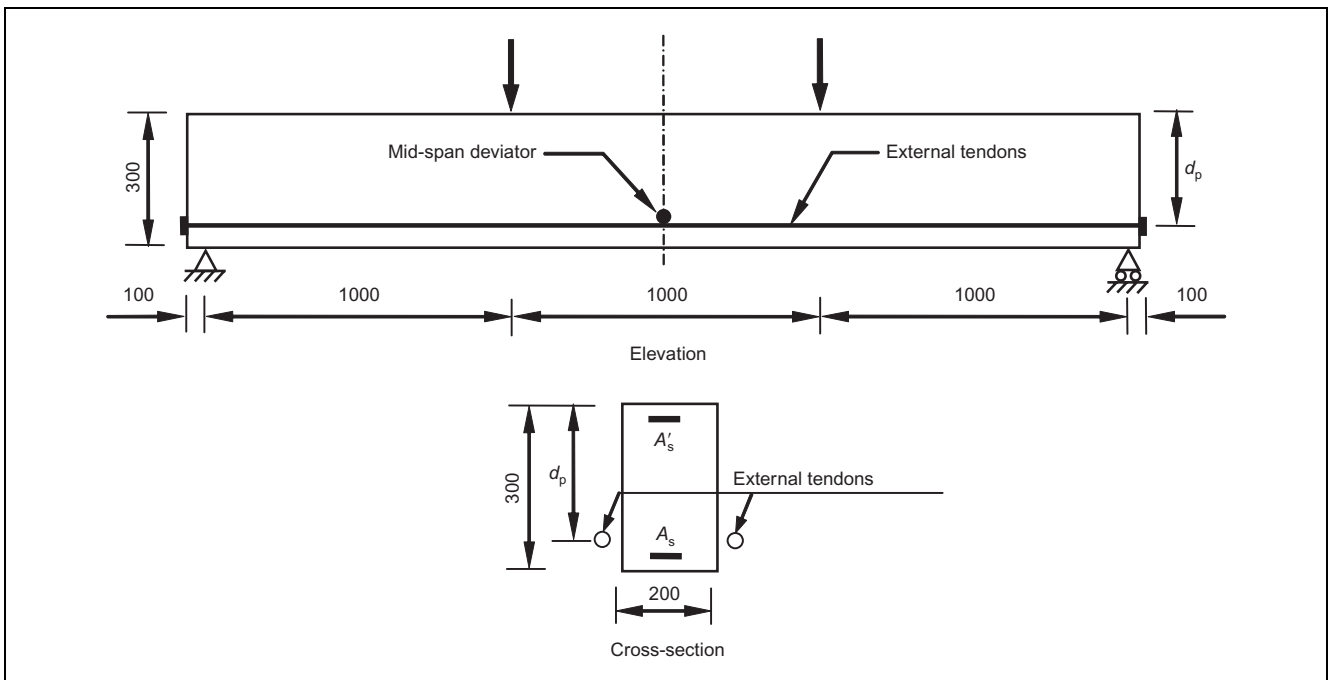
Dimensions of specimens by Du at BJTU (unit: mm)
